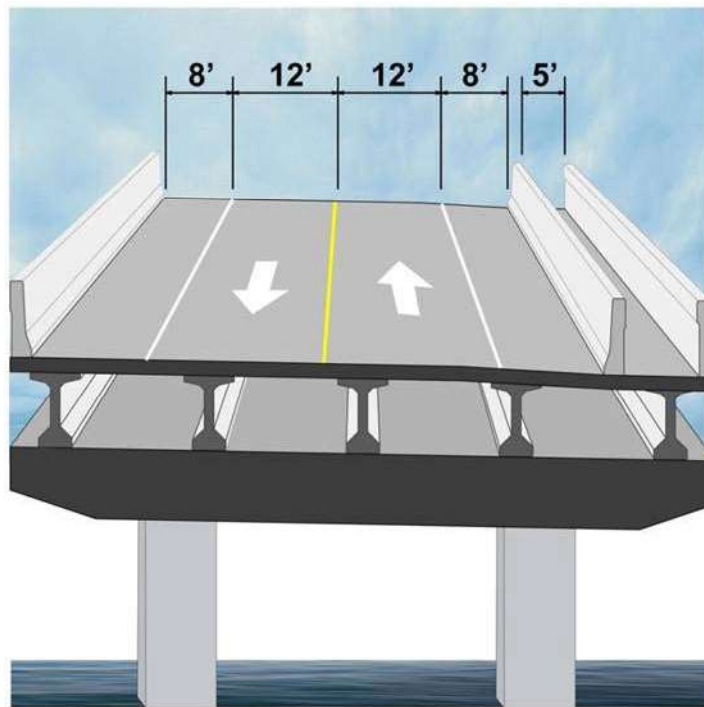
Two-lane typical section for the fixed span bridge at Fort Hamer Road.
